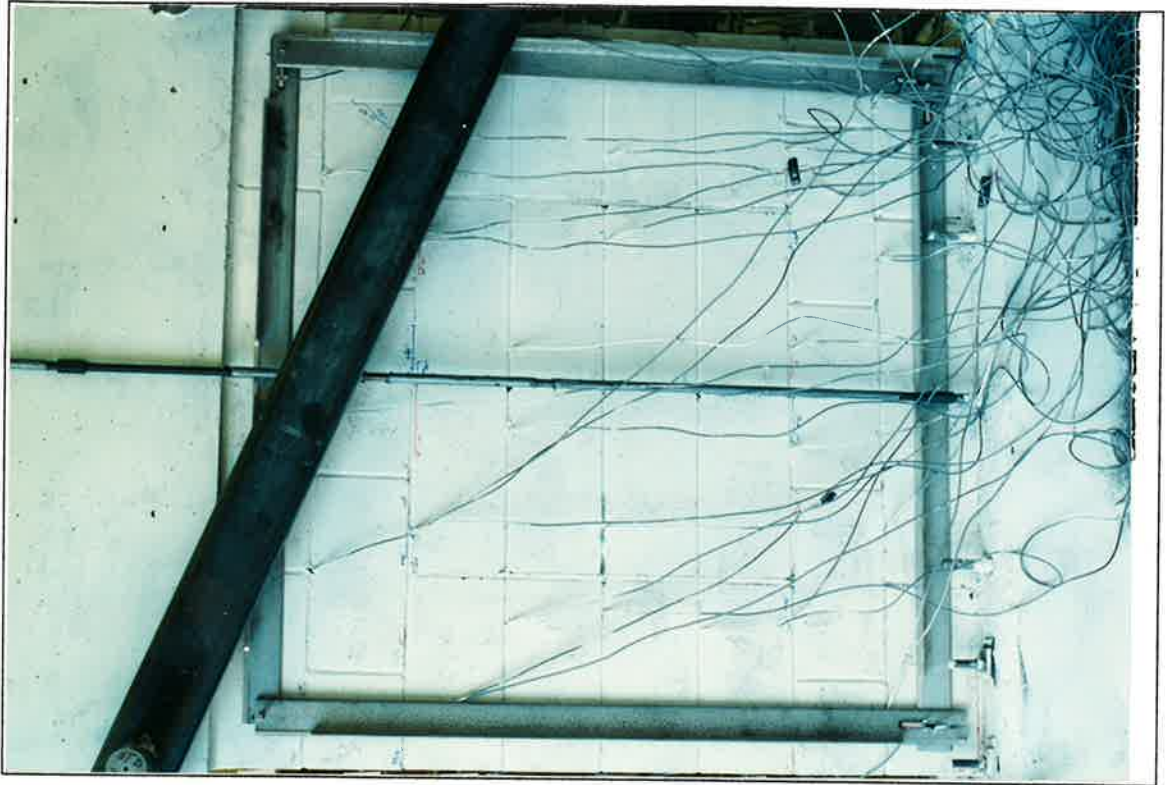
Slitted Wall South Face At 133 kN (30 Kips) Lateral Load
